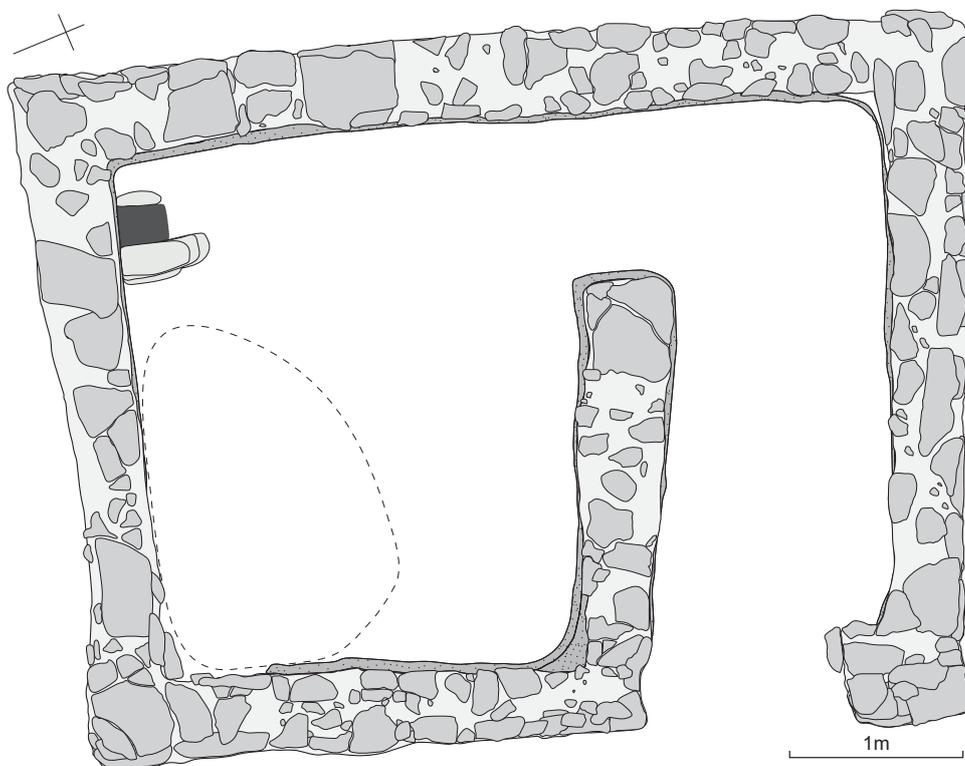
Plan of Building 2 with its fireplace of two rows of stones; the robber pit is its north-western angle, and mortar still covering some walls.
